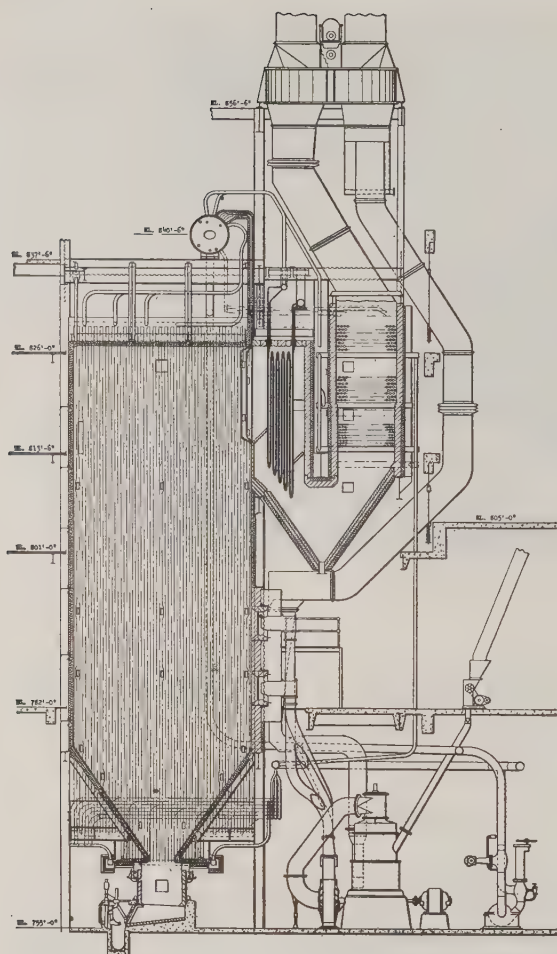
CROSS-SECTIONAL VIEW, FORCED-CIRCULATION BOILER
